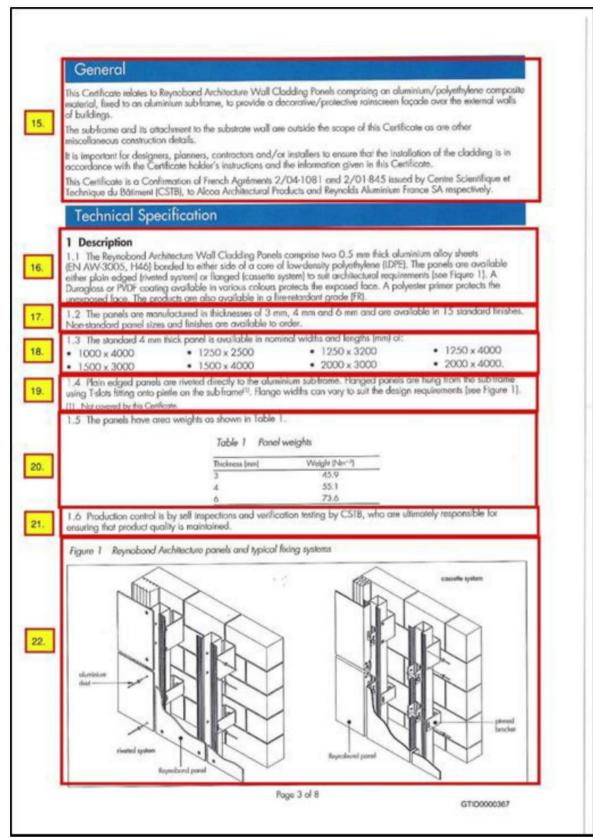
Page 3 of Agrément Certificate 08/4150 Product Sheet 1 Reynobond Architecture Wall Cladding Panels (first issue 14/01/2008) – section numbering added by author
